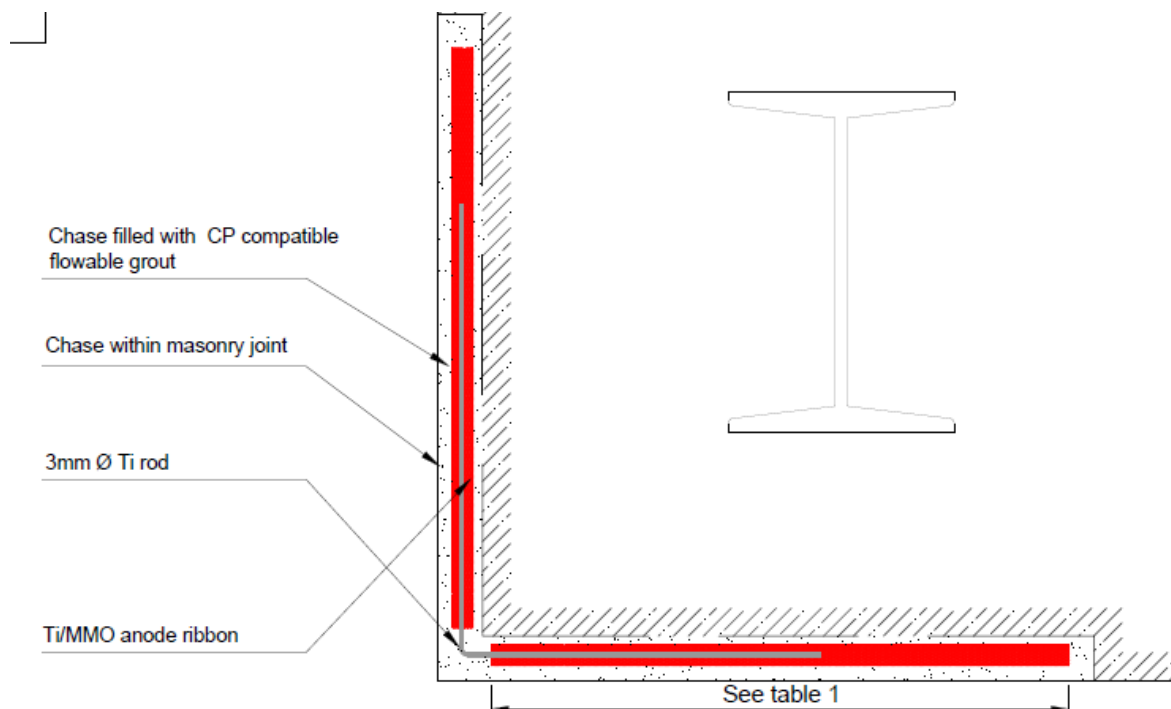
Example horizontal section through corner column showing proposed anode arrangement.
